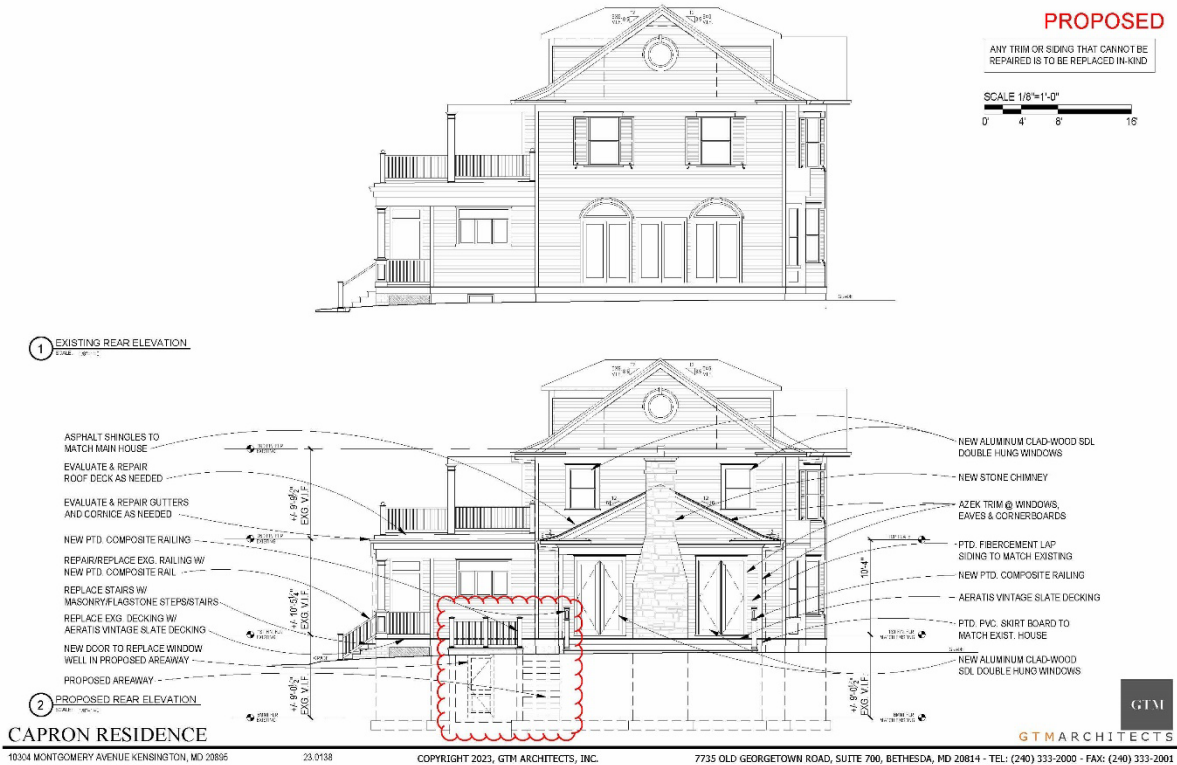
The revised rear elevation shows the existing, top, and proposed areaway clouded in red.
